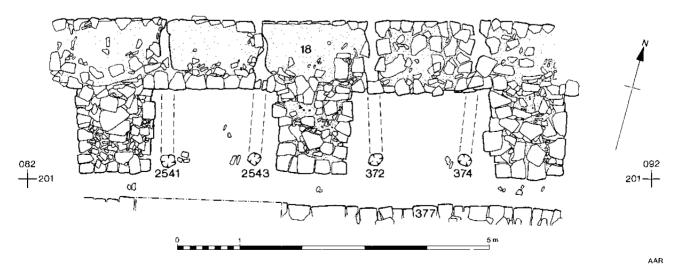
Plan of bays four and five from east on south wall (18) of Building 197 showing scaffolding postholes and putlogs
